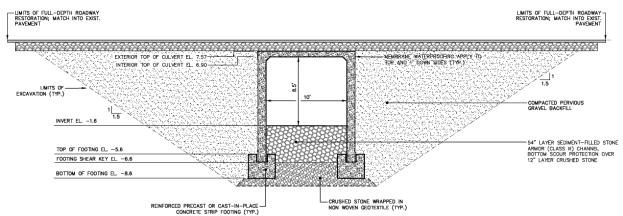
Alternative 1: 10 foot width by 8.5 foot high open bottom culvert.
